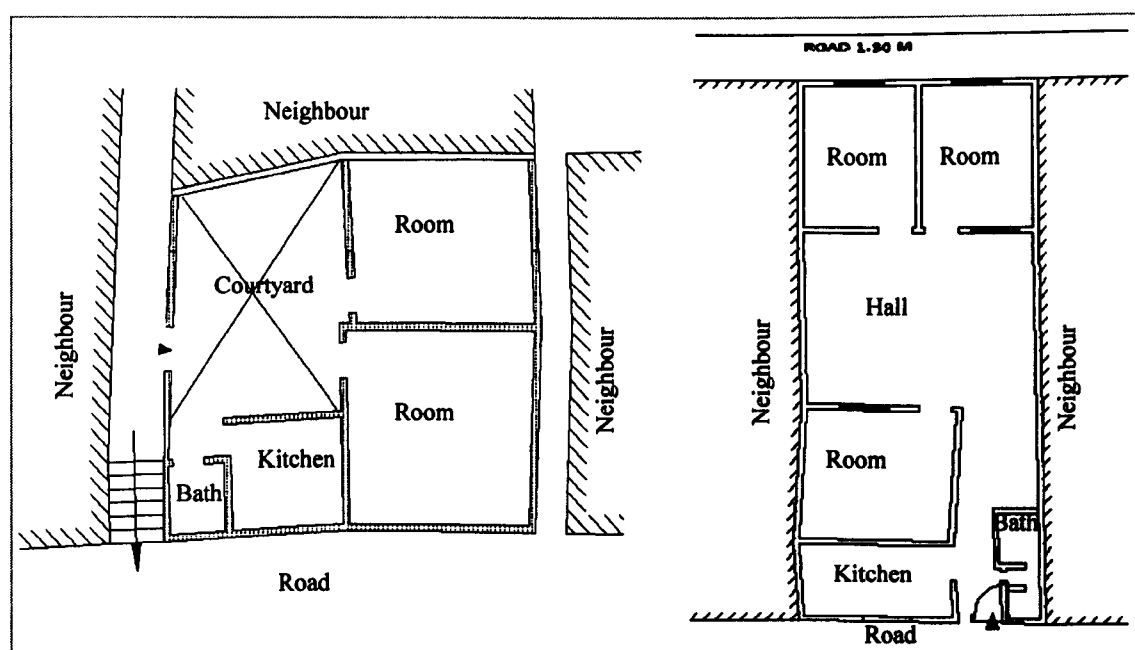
Layouts of shelters in refugee camps, (field survey 2010)
